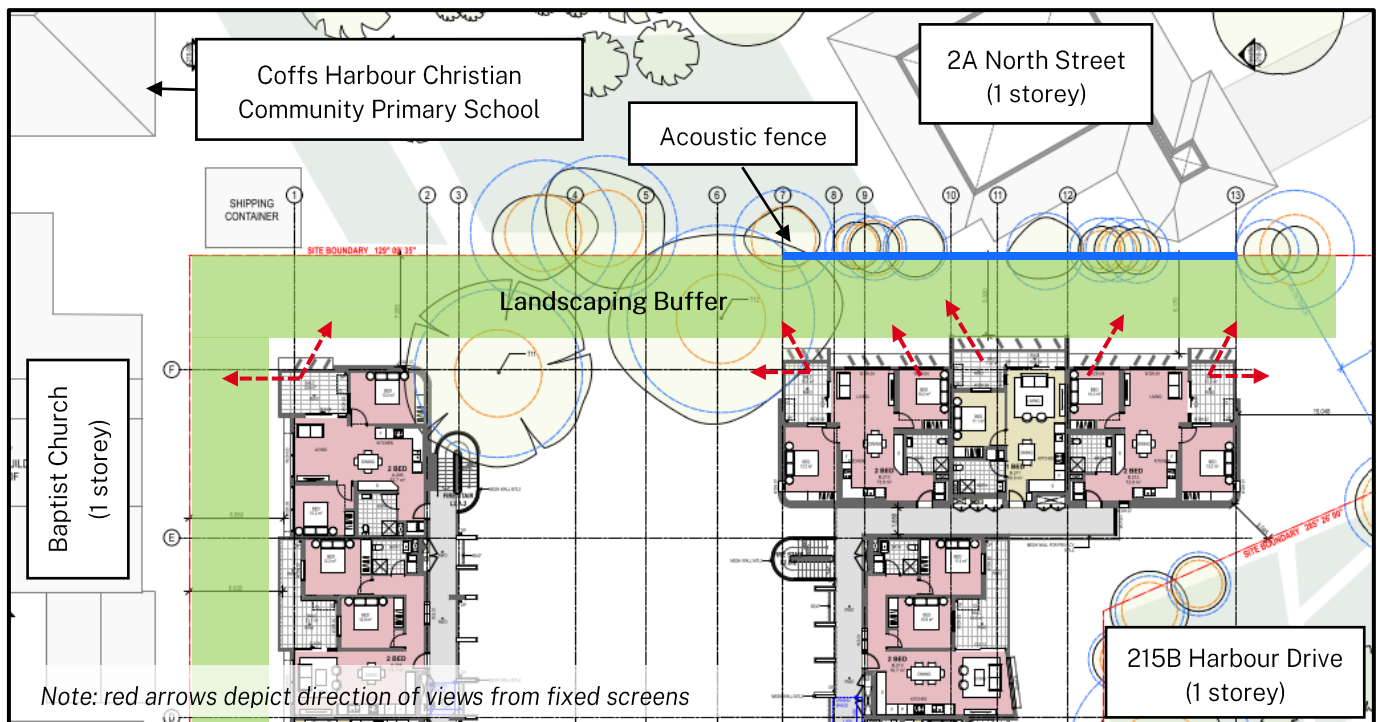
| Consideration of visual privacy impact (base source: Applicant RtS – Revised Architectural Plans)
